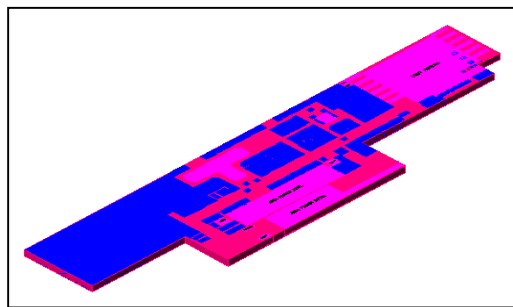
Solid* 3D shape of Blok M mall building at B1 floor
